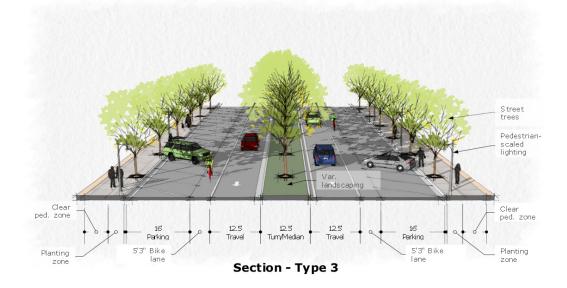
Configuration and dimensional requirements for street section Type 3 areas identified in the Street Section Plan.
